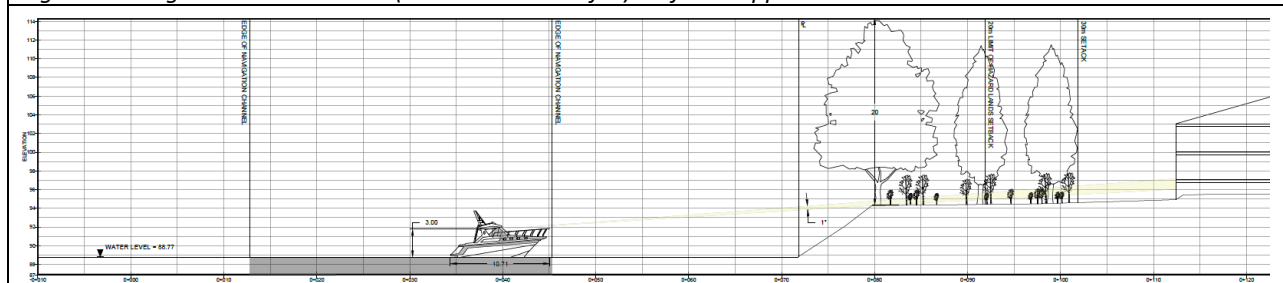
Sightline Cross Section (Section C – C' Profile). Refer to Appendix A
